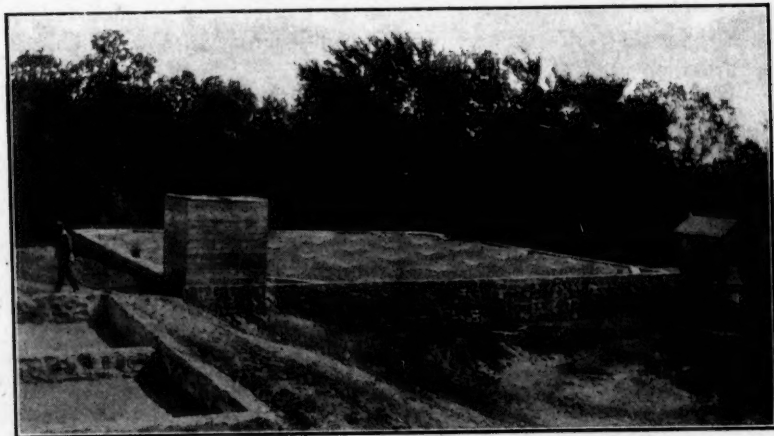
DOSING TANK AND SPRINKLING FILTER, STROUD, OKLA.
